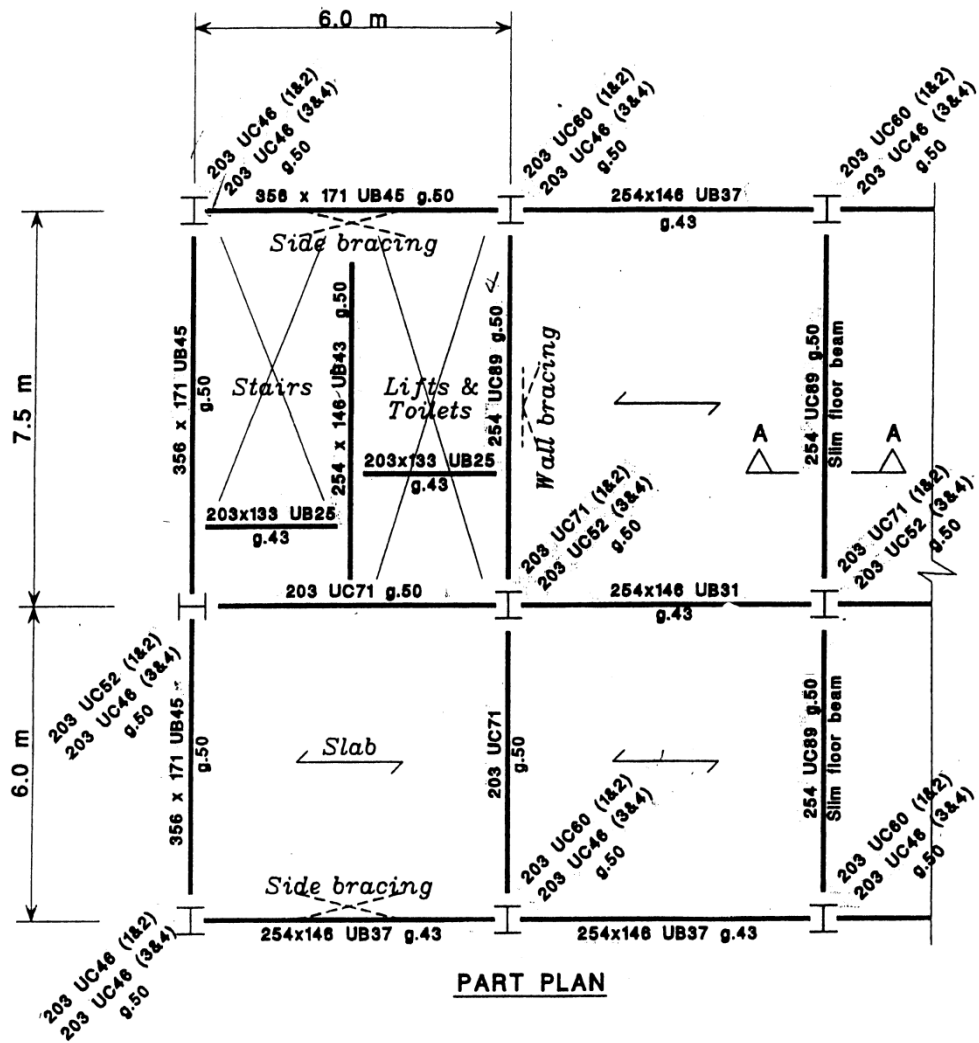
Slimflor[®] beams and deep deck floor (un-propped) (SCI 2004)
